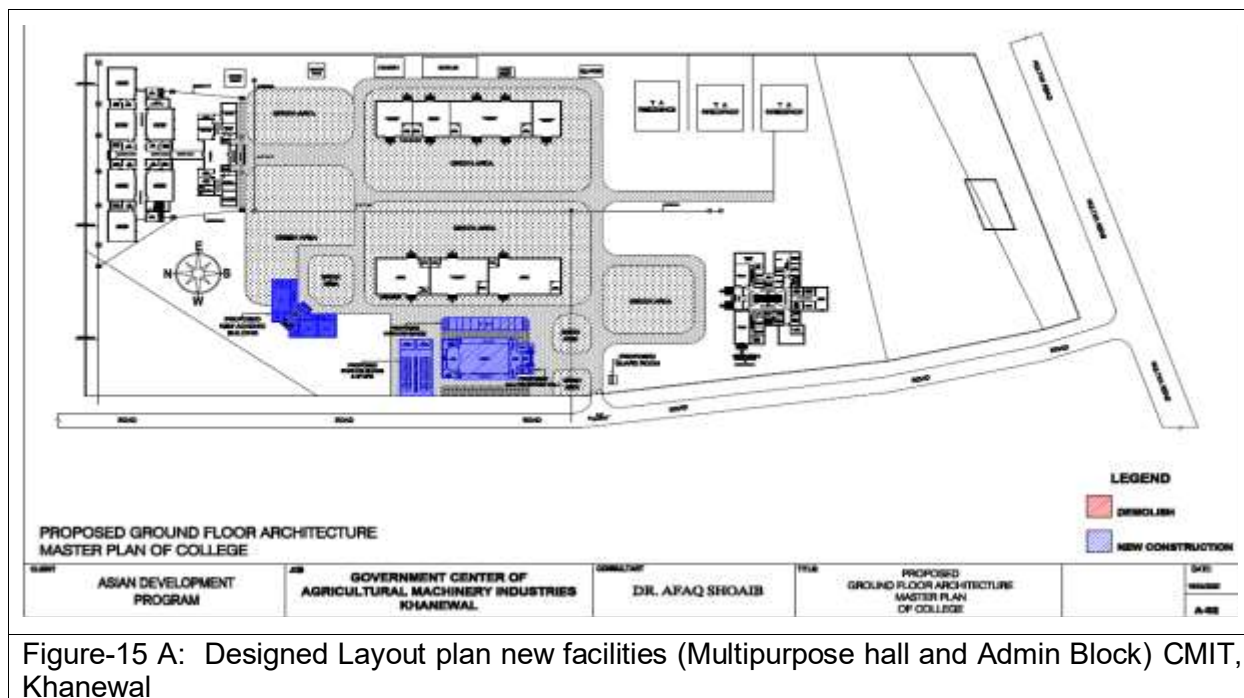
A: Designed Layout plan new facilities (Multipurpose hall and Admin Block) CMIT, Khanewal
